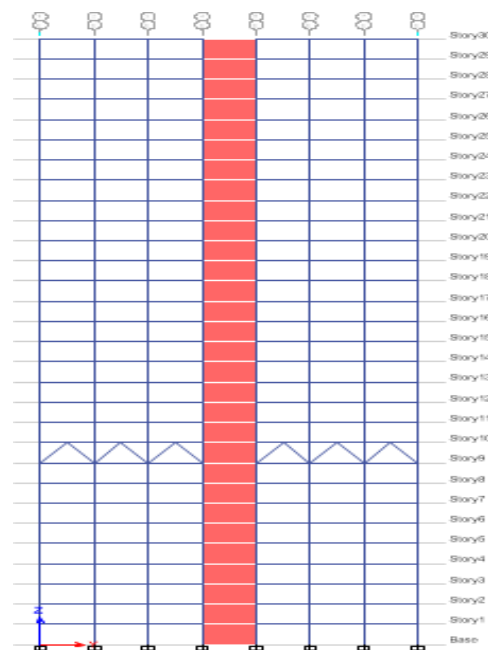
R.C.BUILDING SHEARWALL & OUTRIGGER AT 10TH STOREY
